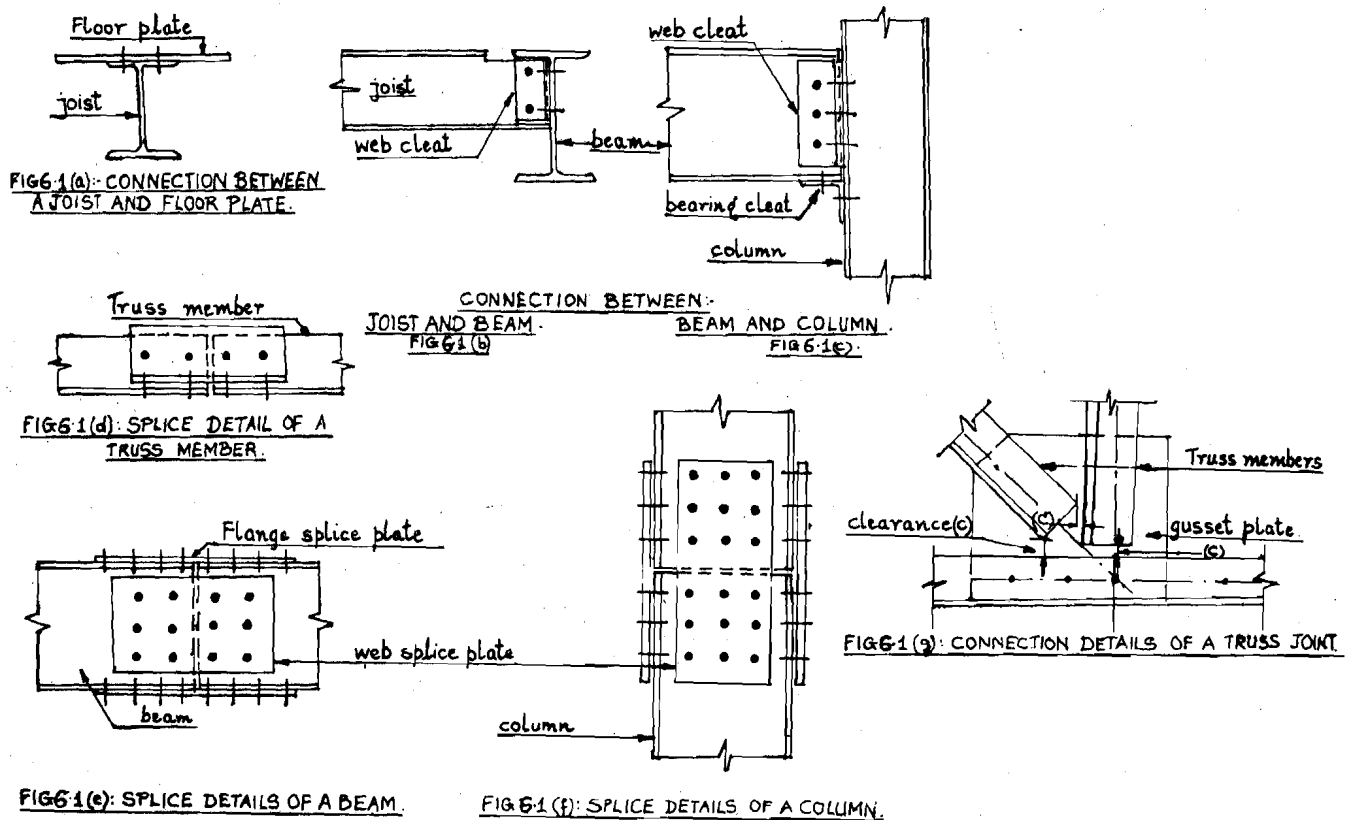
Schematic Details of Typical Joints in a Riveted Structures
